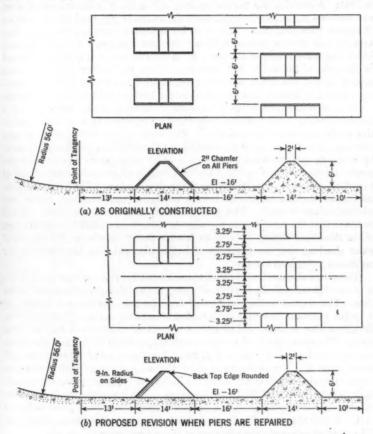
Dimensions of Baffle Piers, Spillway Apron, Bonneville Dam
